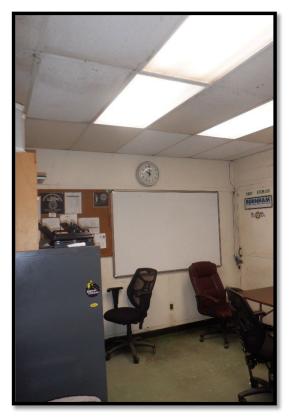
Suspect ACM Ceiling Tile, Sheetrock/Joint Compound
